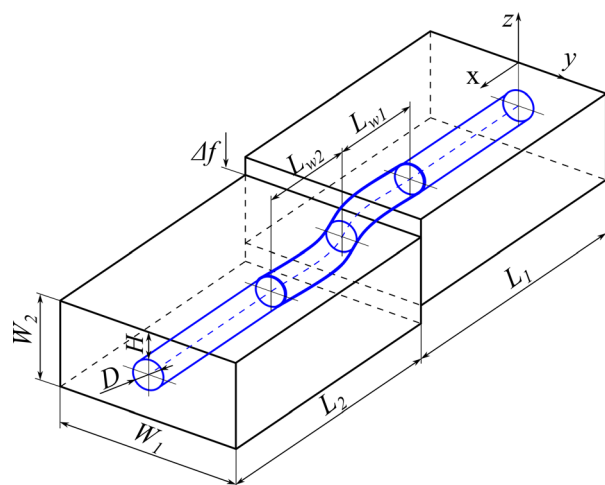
Structural model of a reinforced pipe crossing a normal-slip fault
